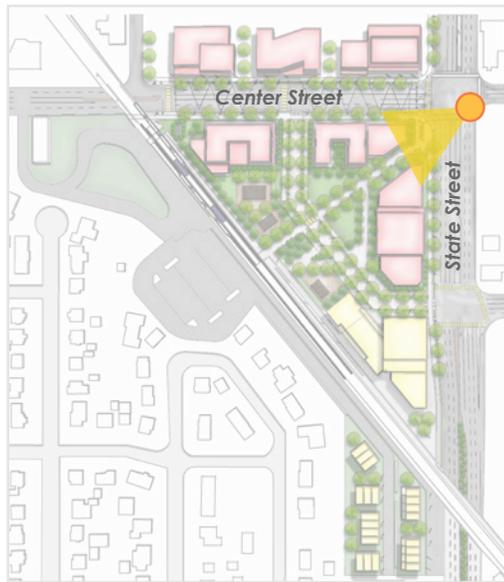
Bird's Eye View of Center Station Proposed Plan
